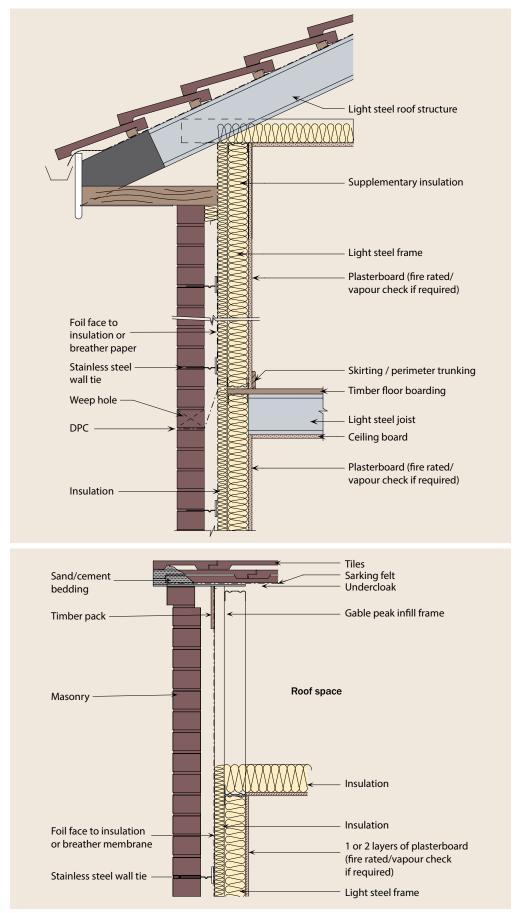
Generic detail – external wall connection with eaves and intermediate floor
